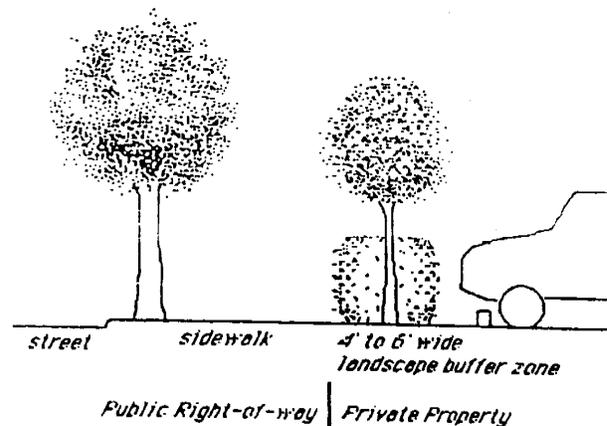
A landscape buffer zone should be 4' to 6' in width on private property to provide an adequate visual barrier for exposed parking, in addition to any required street trees.
